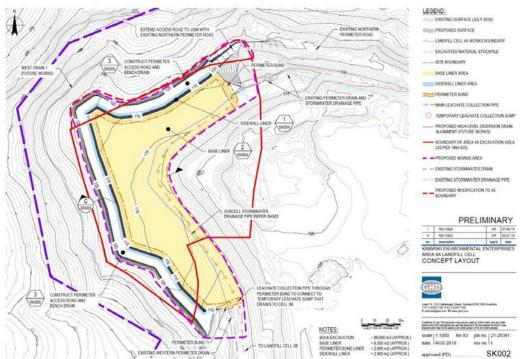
Proposed Area 4a Landfill Cell - Concept Layout
